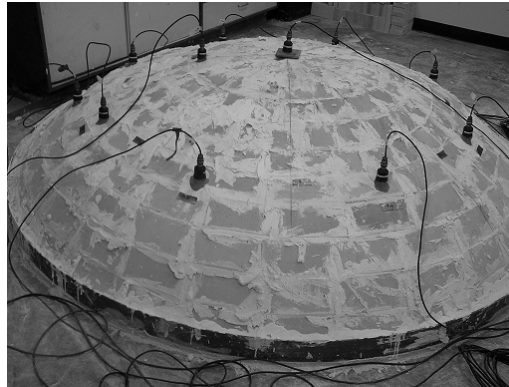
The scaled dome constructed with AAC tile and fast-setting gypsum cement.
